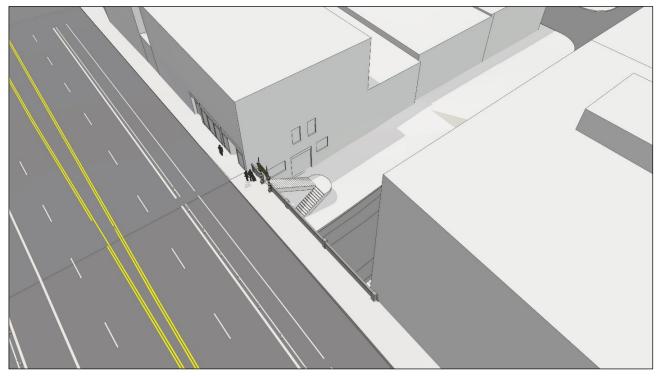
Existing pedestrian access at north side of west approach, artist's rendering, aerial view looking northwest (Fat Pencil Studio, 2021).
